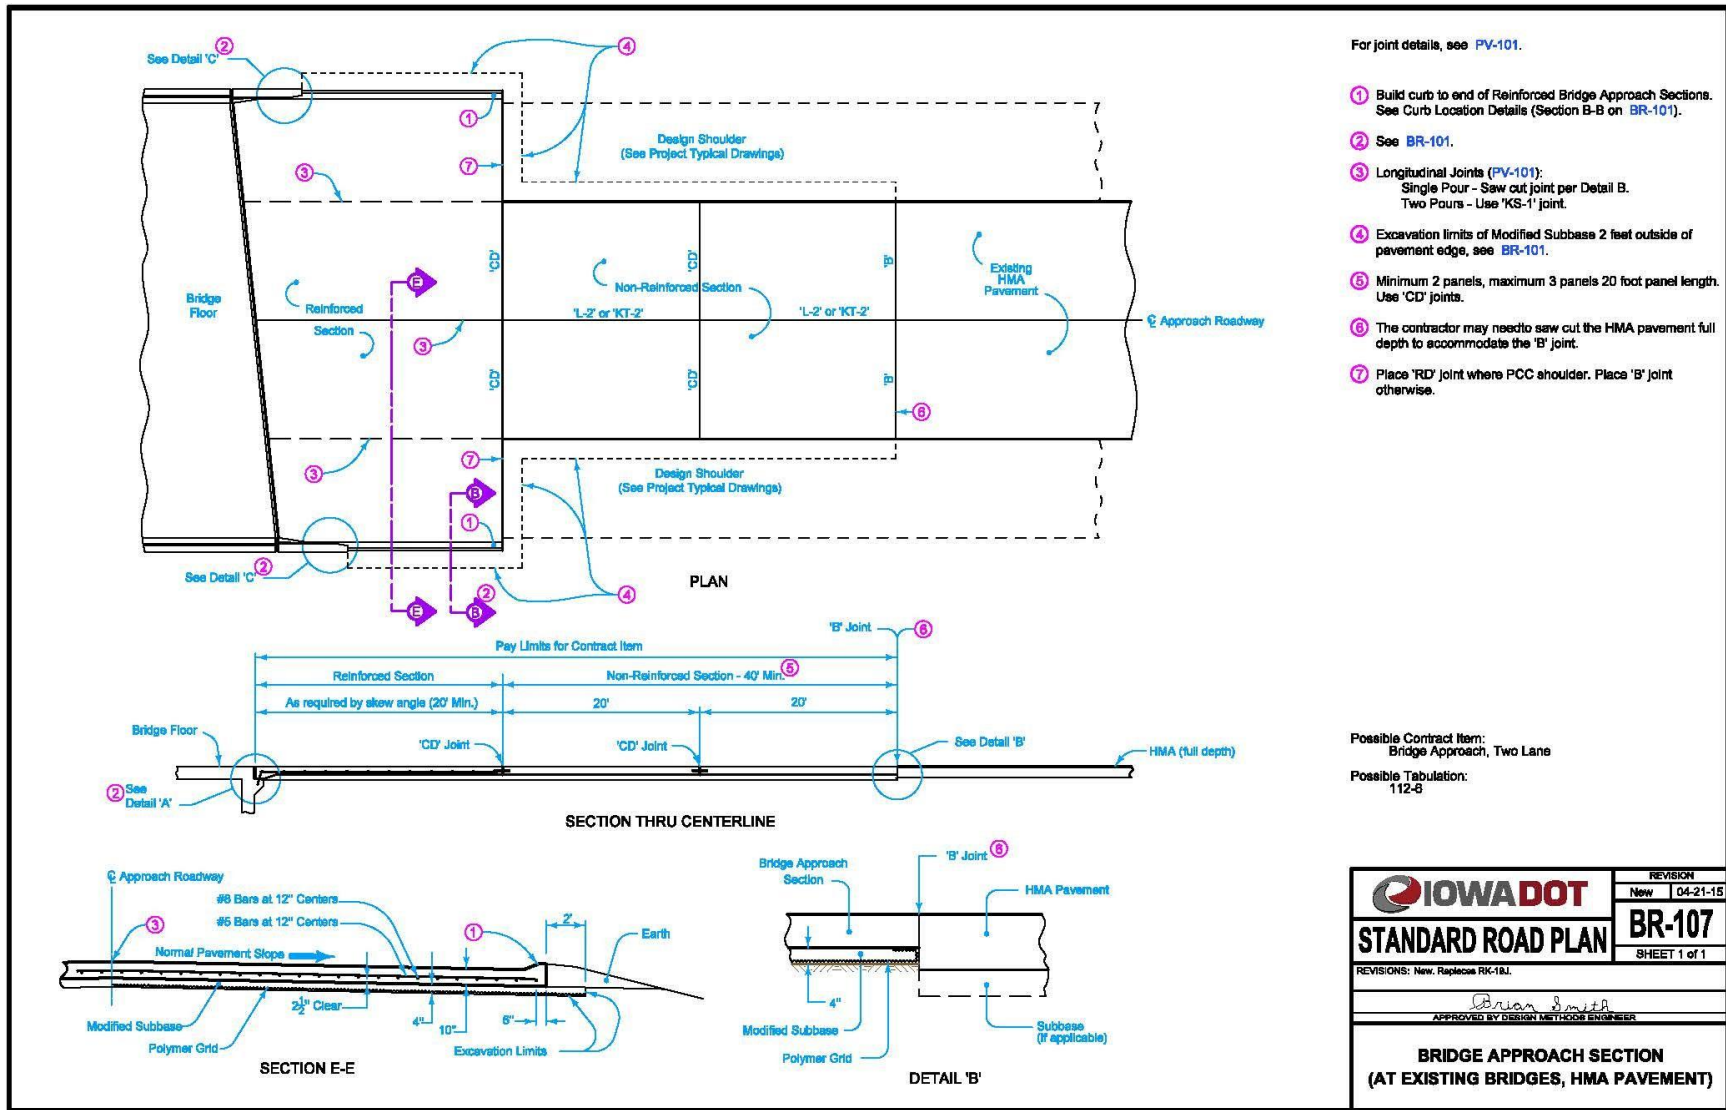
Iowa DOT Standard Road Plan BR-107 – Bridge Approach Section (at Existing Bridges, HMA Pavement) [68]
